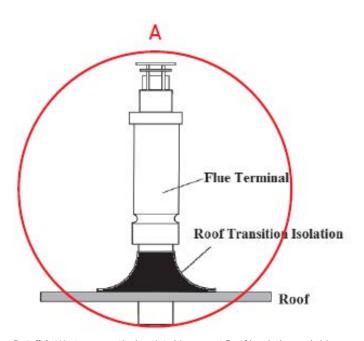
Detail A: Waste gas vertical outlet chimney set and Pitched Roof Outlet Tile part installation for Roof
